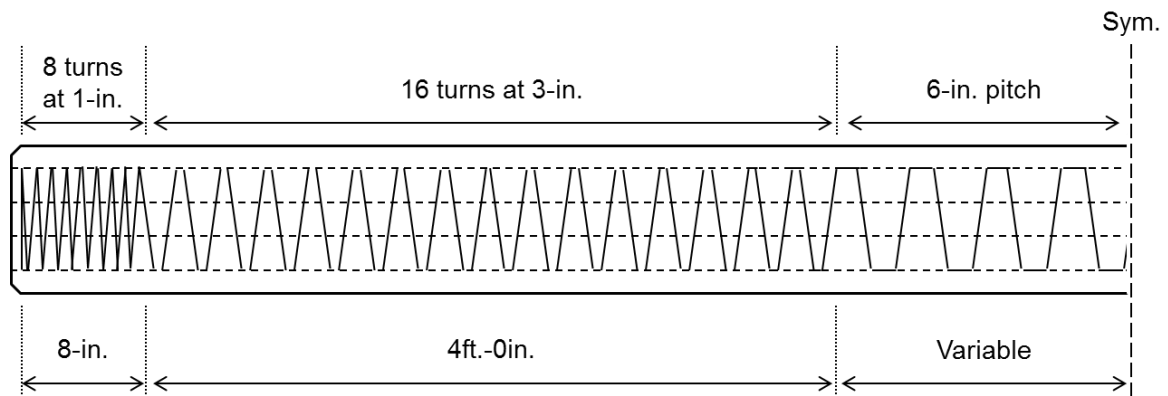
Wire spiral layout for prestressed concrete piles. (1-in. = 2.54 cm)
